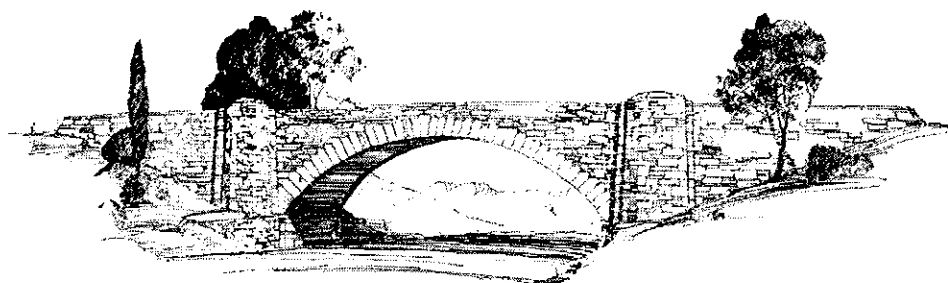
Architectural elevation of overpass at proposed airport entrance
